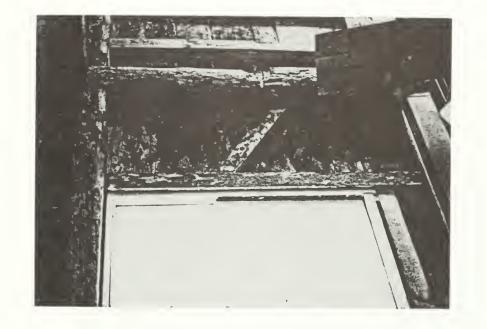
West India Goods Store, interior of second story, east wall, south half of bay B, showing interior sheathing and angled brace that has been cut to accommodate a window.
